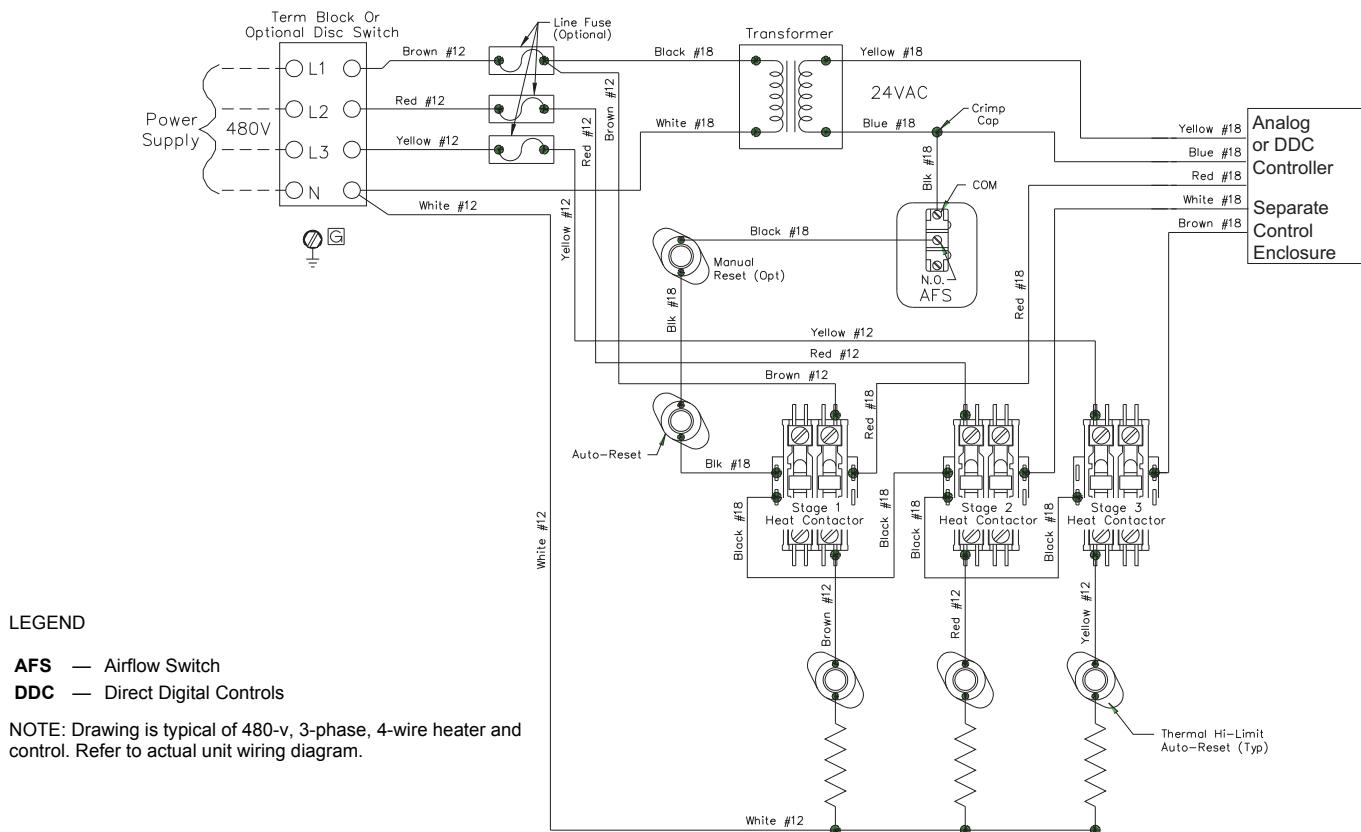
Typical Power Connections for 35E Units with 3-Stage Electric Heat
